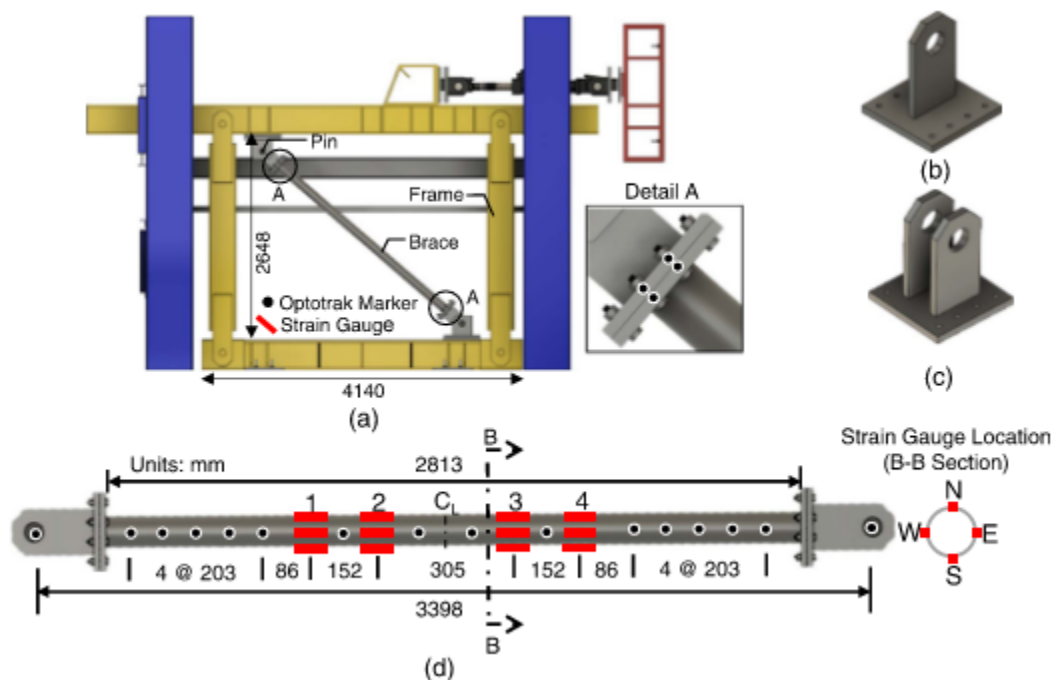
Test setup for A500 Gr. B braces: (a) load frame; (b) single plate pin connection; (c) double plate pin connection; (d) brace instrumentation and strain gauge locations.
